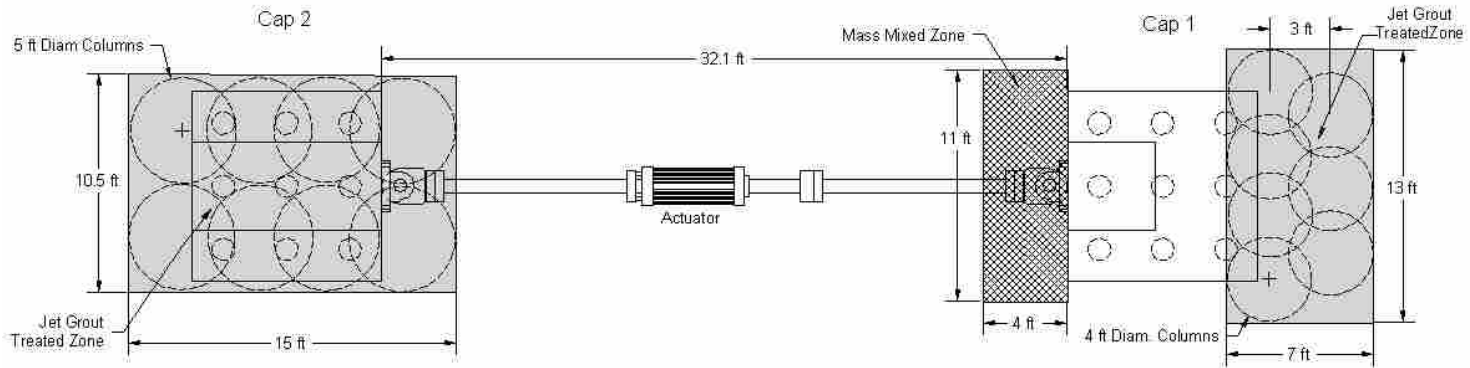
Plan views of cap 2 (left) and cap 1 (right) after mass mixing and jet grouting soil improvements. (Dimensions in feet)
